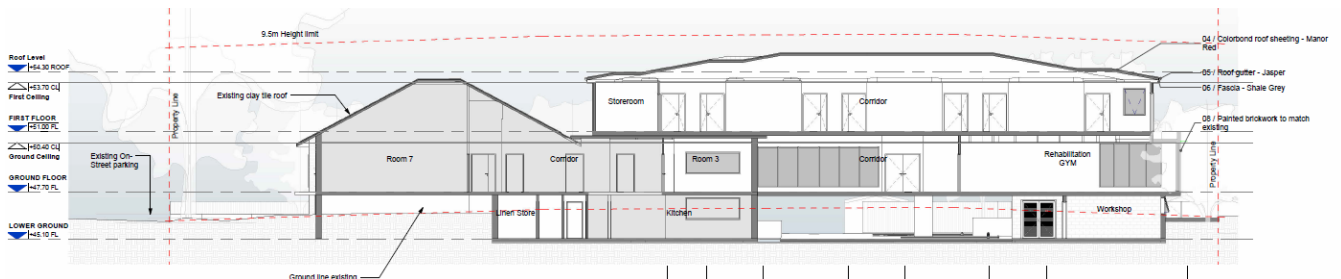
Proposed Excavation to Extend the Lower Ground Level and to Create a Newly Introduced Three Storey Component (New Works in White/Existing Facility Shaded in Grey)
